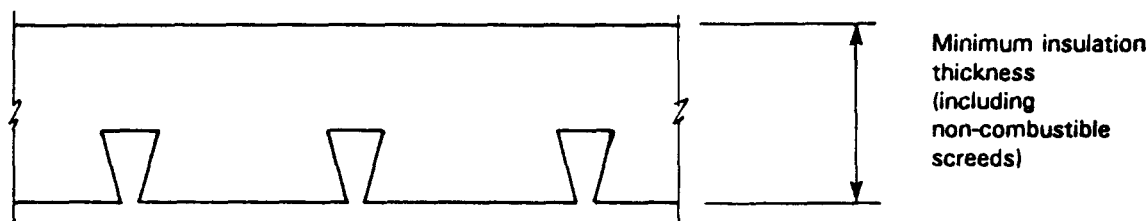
Measurement of minimum insulation thickness of concrete for re-entrant profile decks
